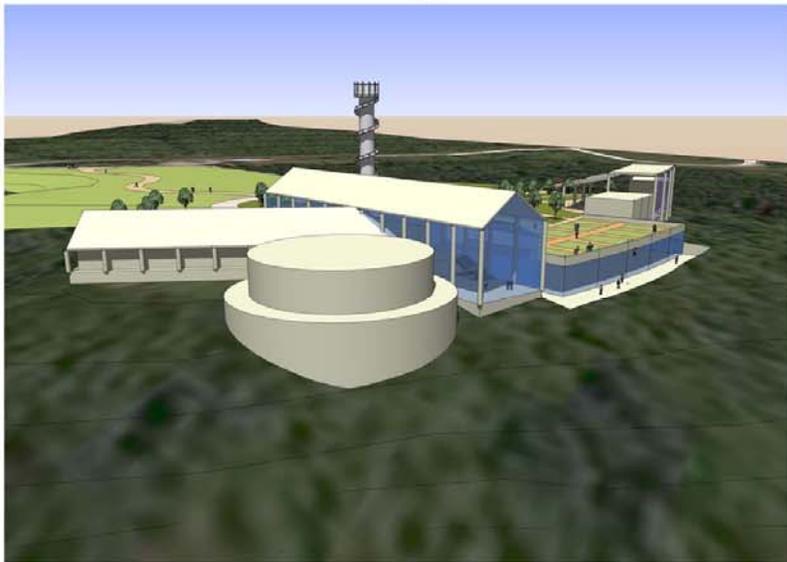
Site Plan of Cordova Center at Lake Red Rock
